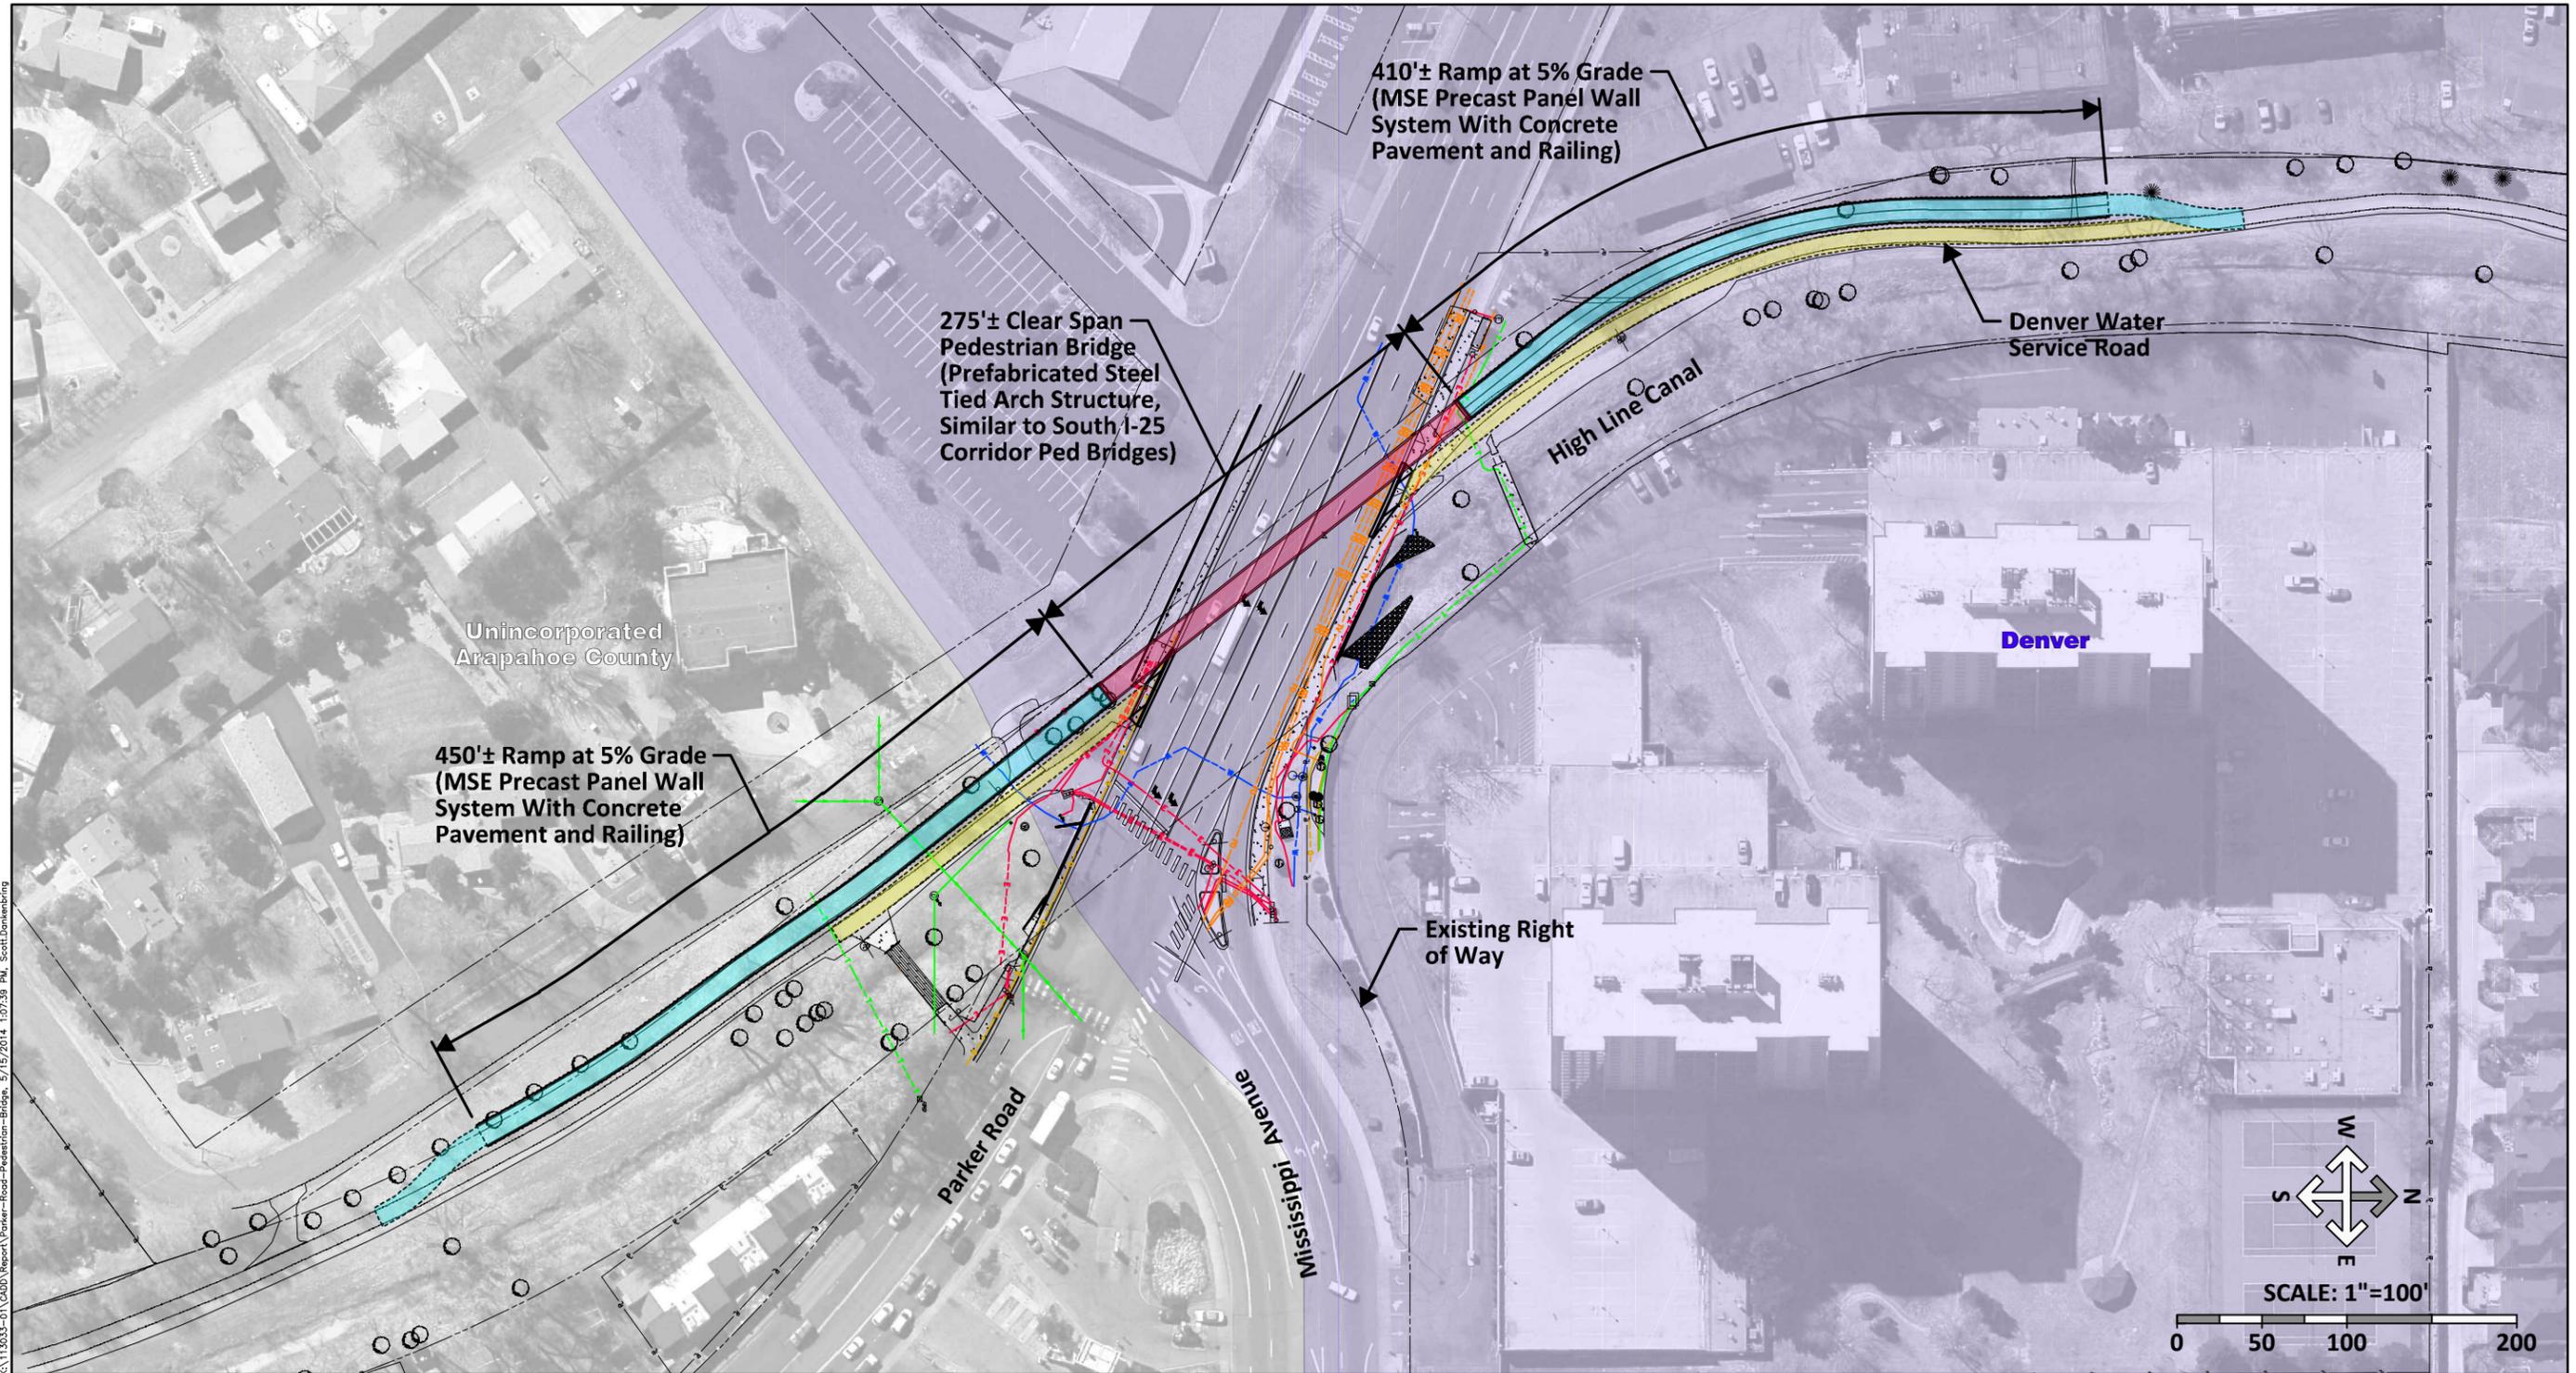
Parker Road at Mississippi Avenue Crossing Pedestrian Bridge
